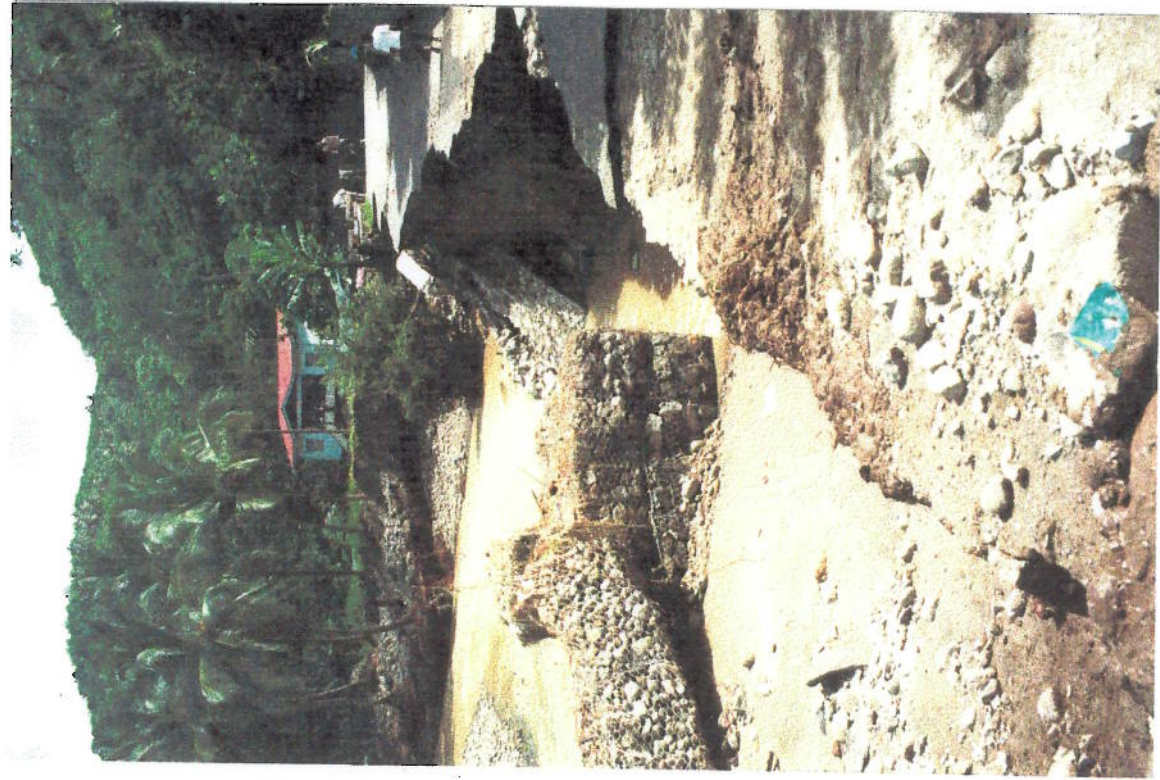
Phase 1 Works: As Photo 11 but after 26th. Wall/road collapsed, gabions 'discarded'.
